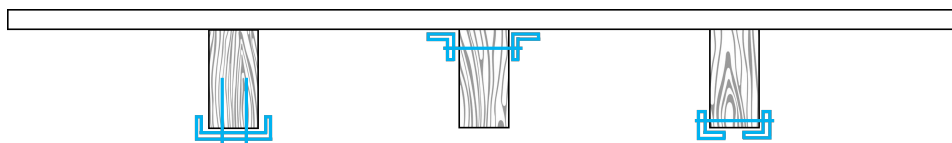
Examples of reinforcement techniques of timber floor beams with additional steel elements
